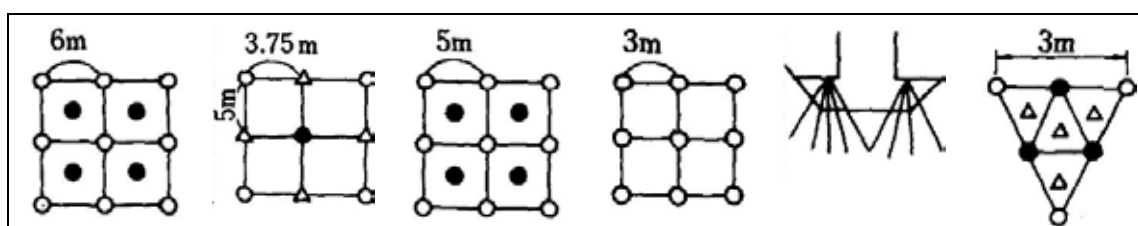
Arrangements of Consolidation Grouting (2)
